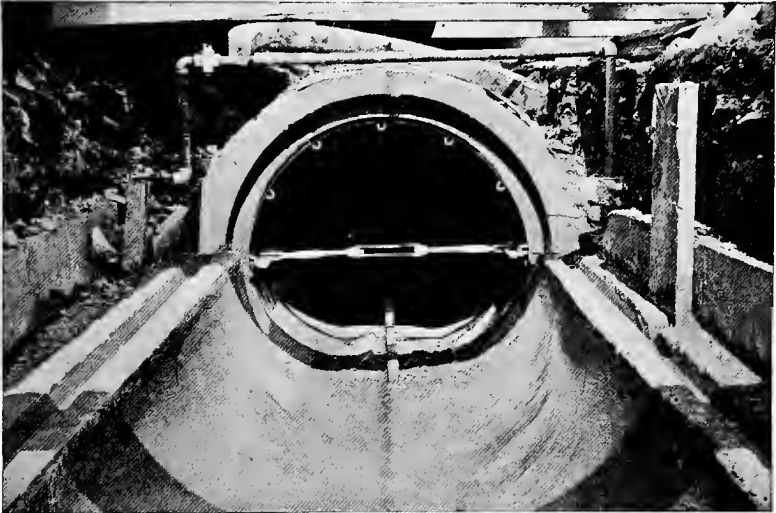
FIFTY-TWO-INCH CONCRETE SEWER.
